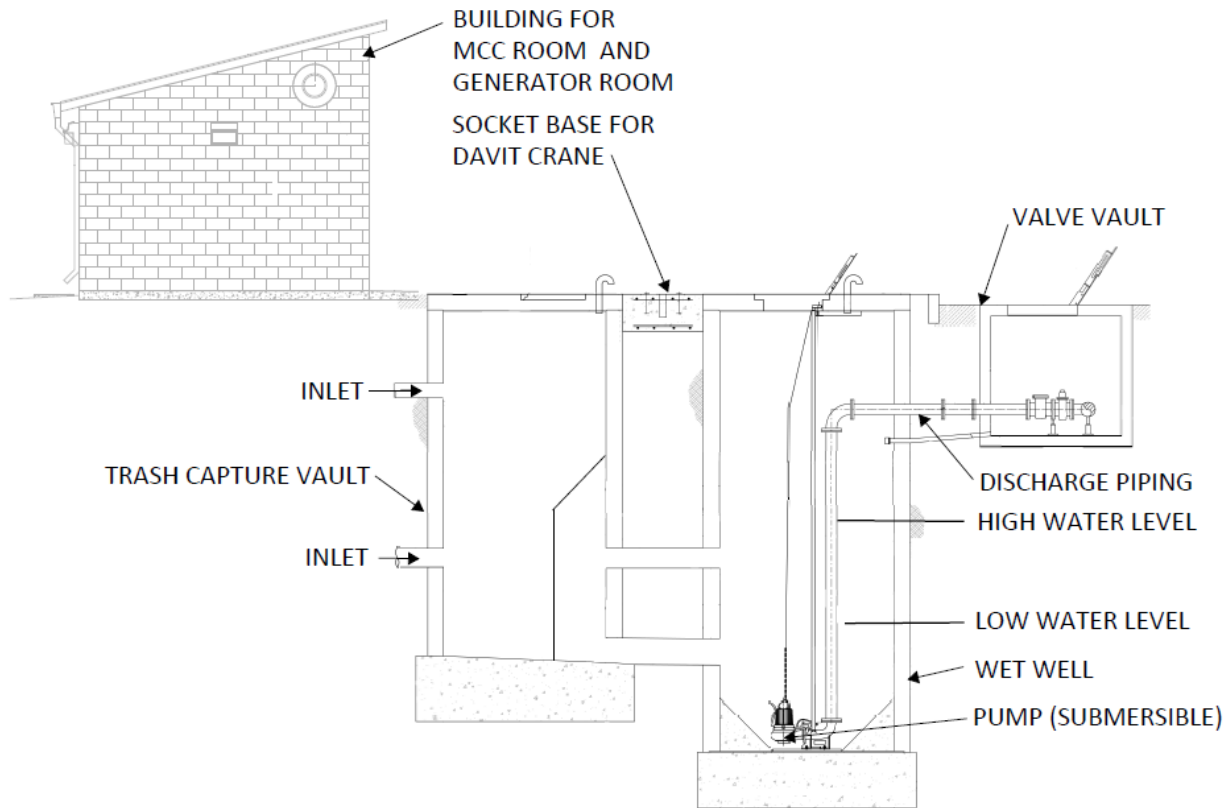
Example of Submersible Pump Wet Well Pump Station
